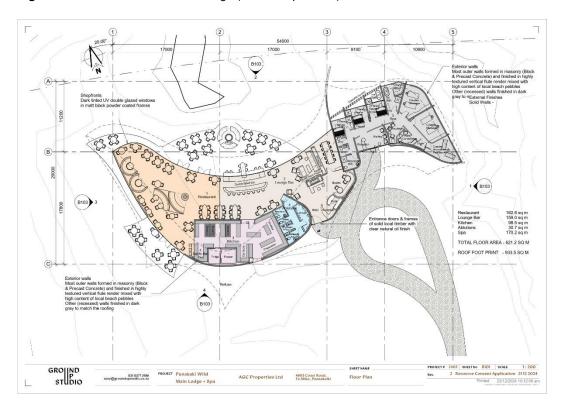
Floor Plan – Lodge (Ground Up Studio)
